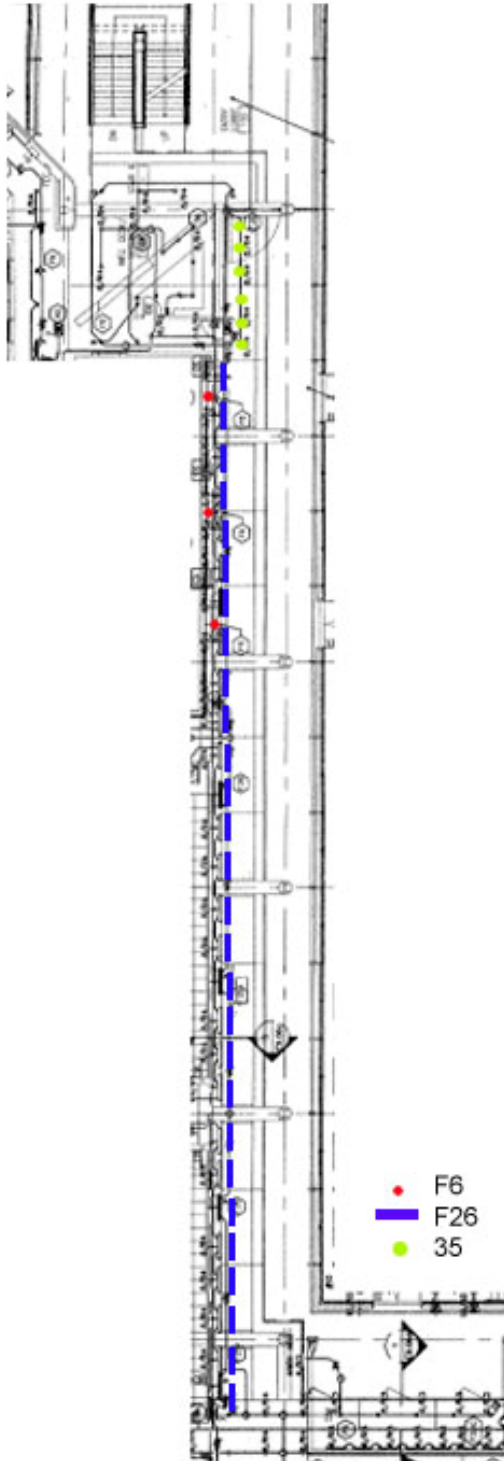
Level 1 Galleria Lighting Floor Plan
